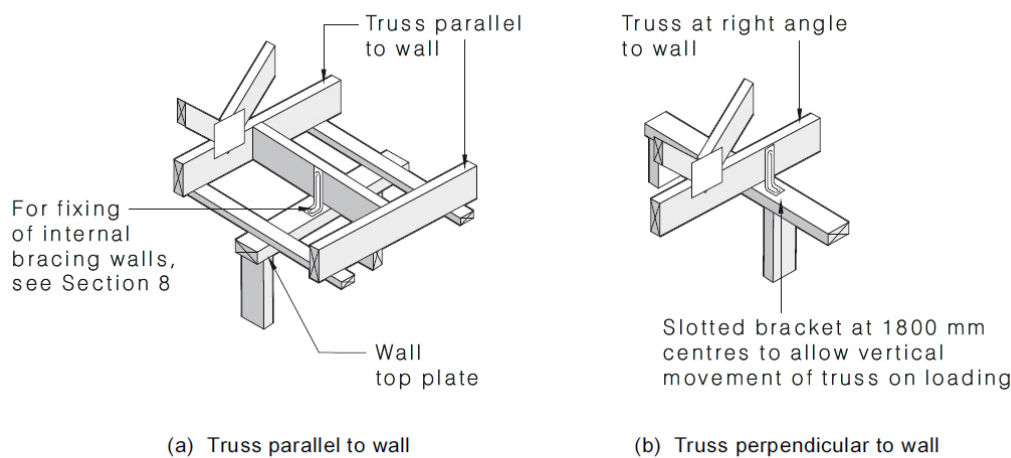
FIXING OF TRUSSES TO A NON-LOADBEARING INTERNAL WALL
